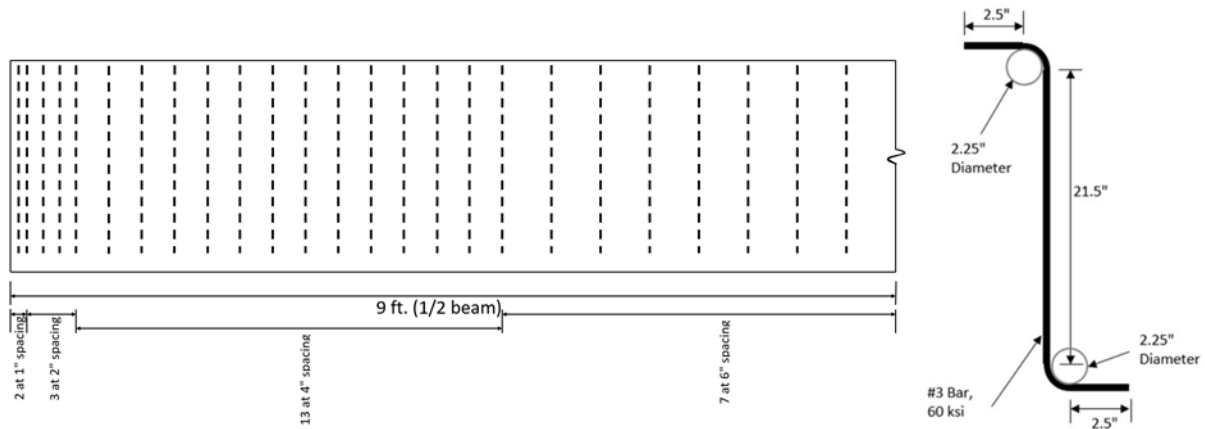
Shear reinforcement spacing and details for small-scale beam designs
